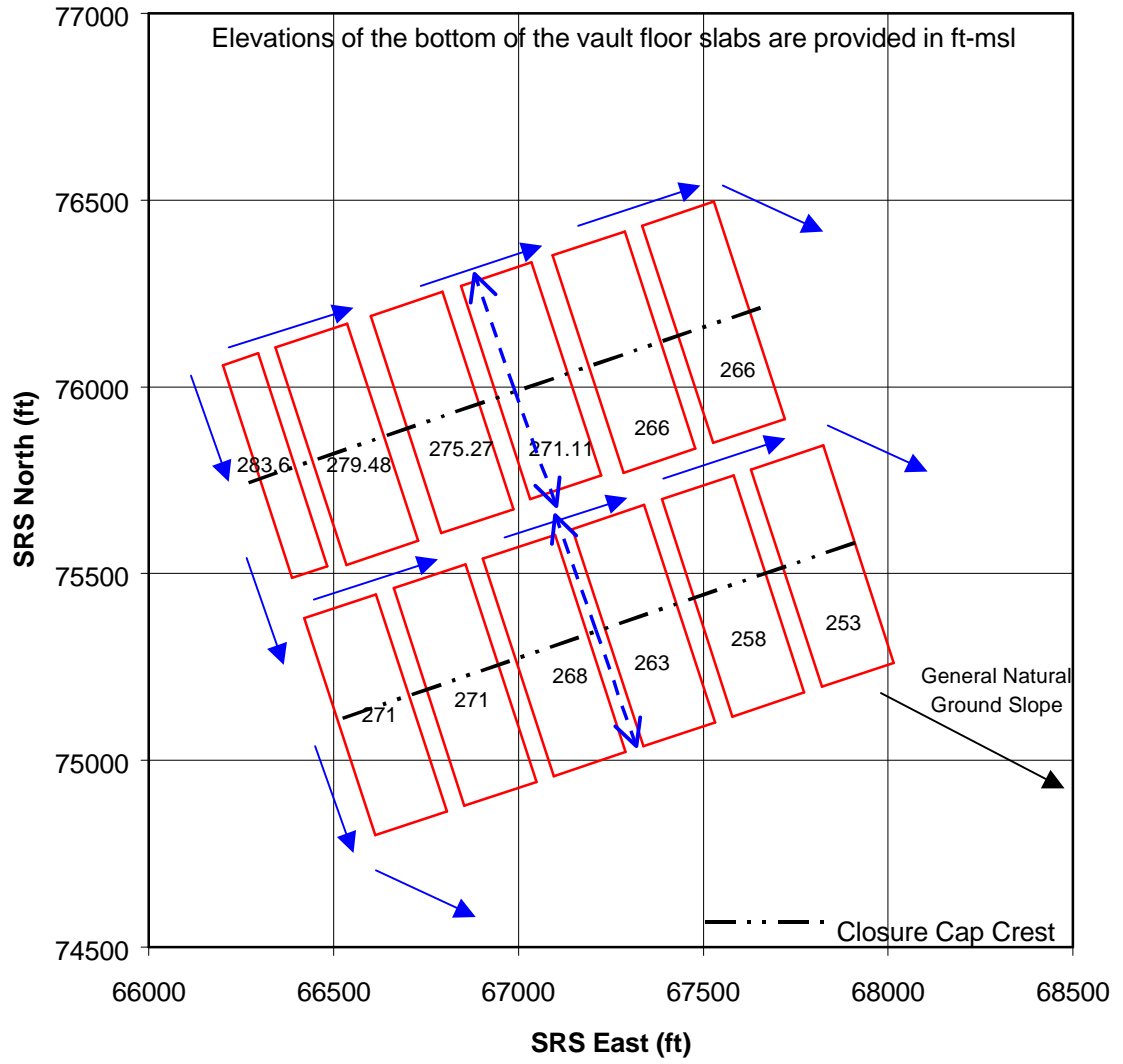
300-Foot Slope Length Drainage System Configuration
